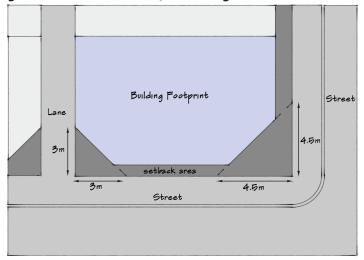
Corner Setbacks for Buildings in Commercial Zones
